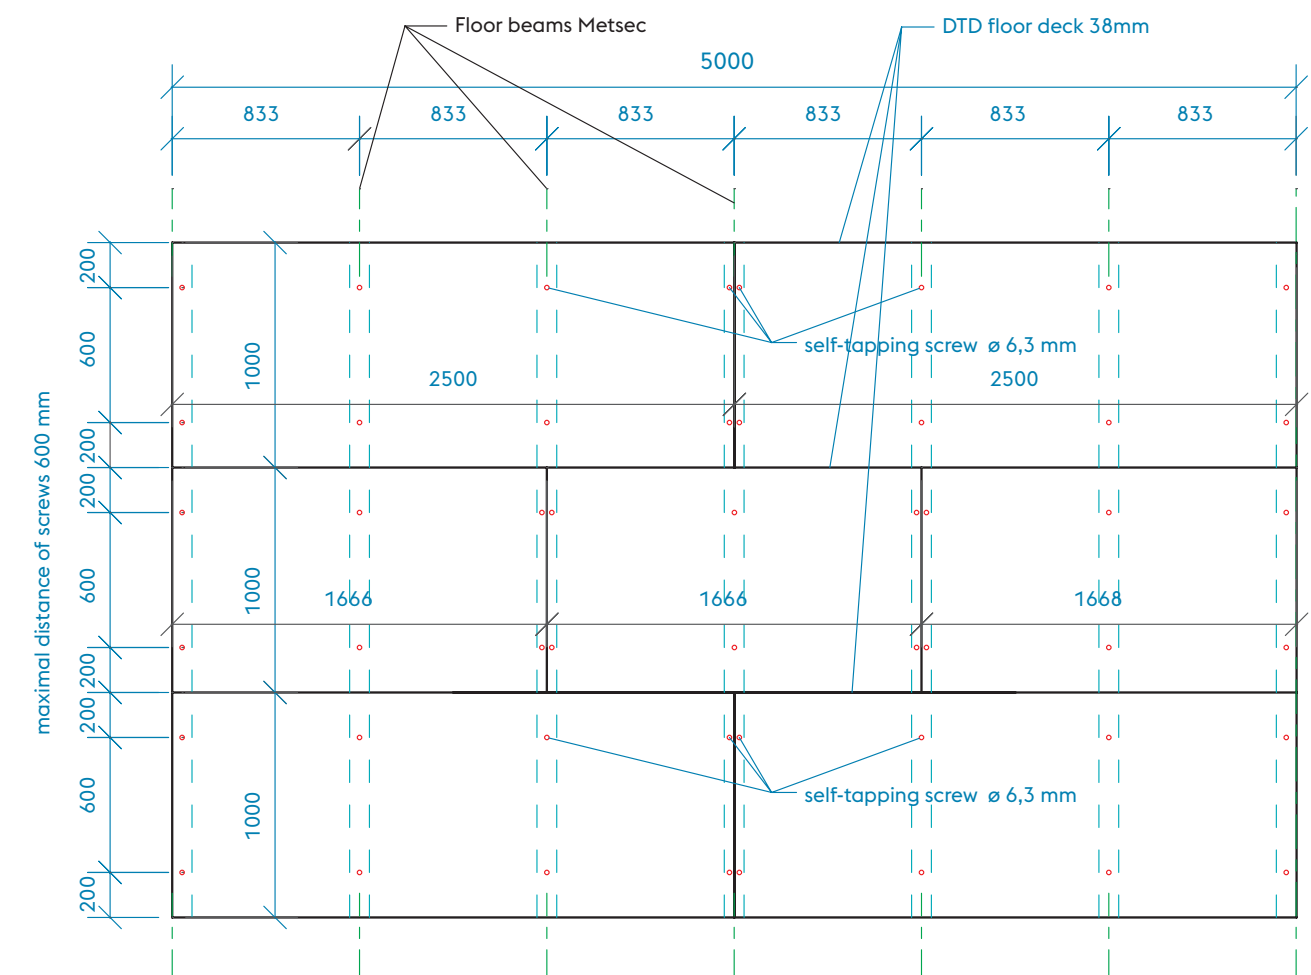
Layout of the screws fixing the deck to the floor beams
